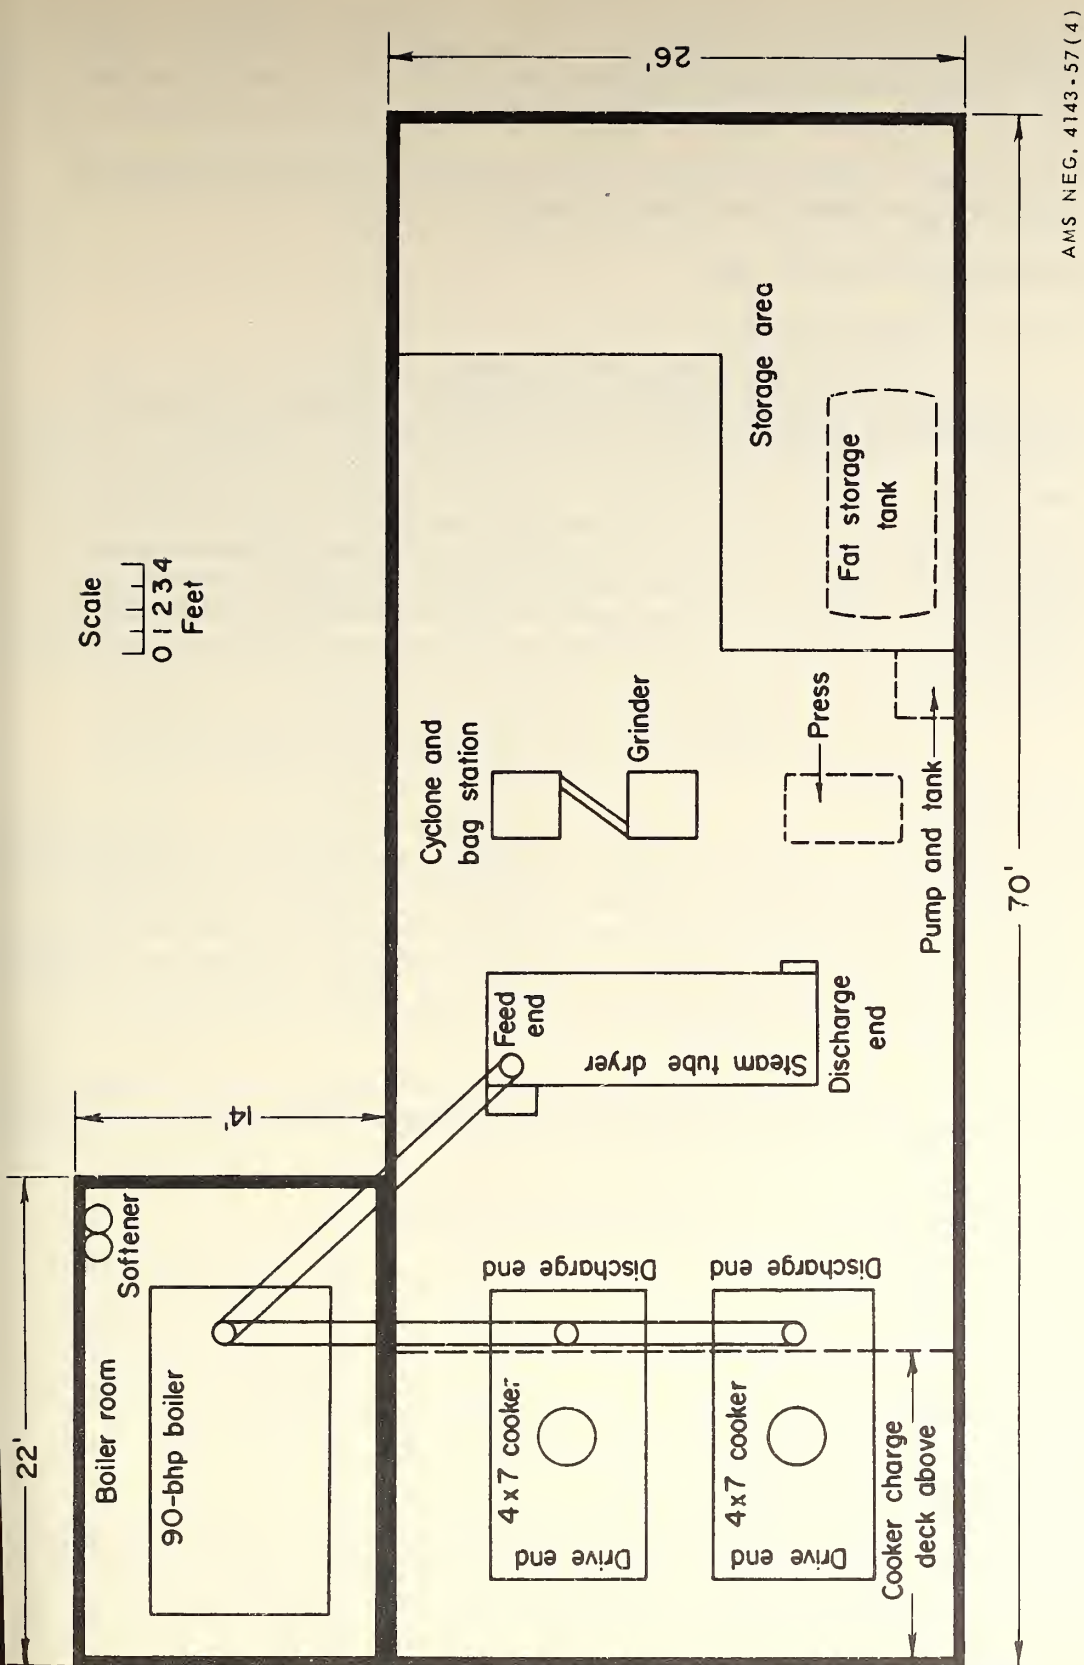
SAMPLE LAYOUT FOR PLANT D
